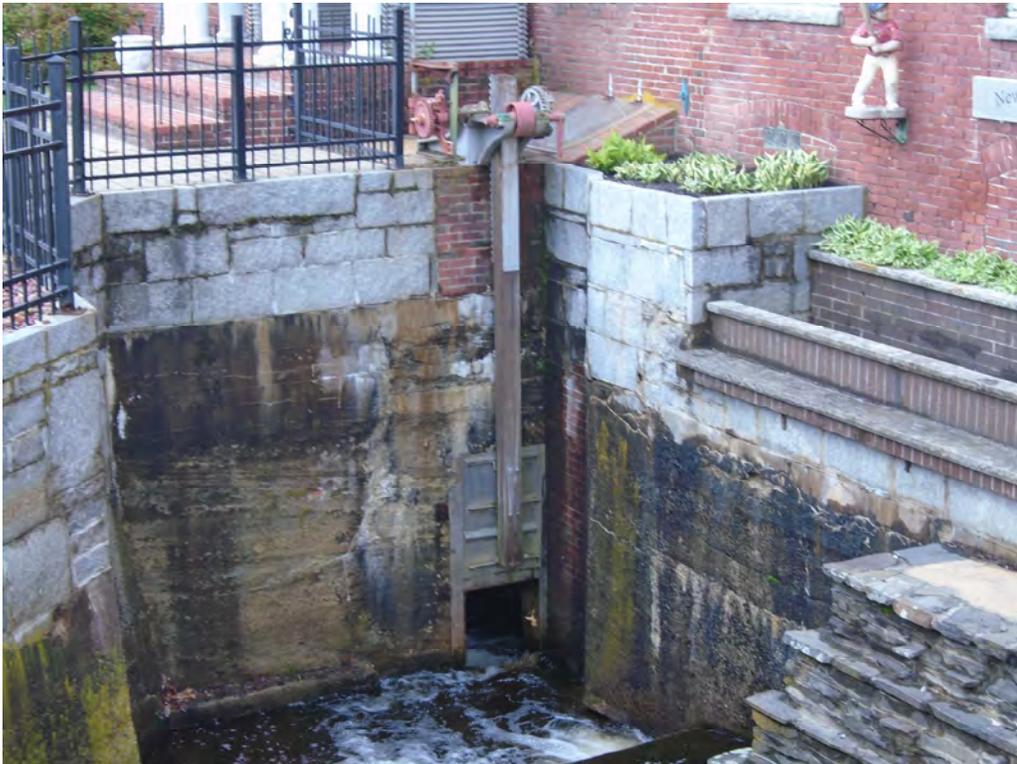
Downstream of Spillway Viewed from Right Abutment
